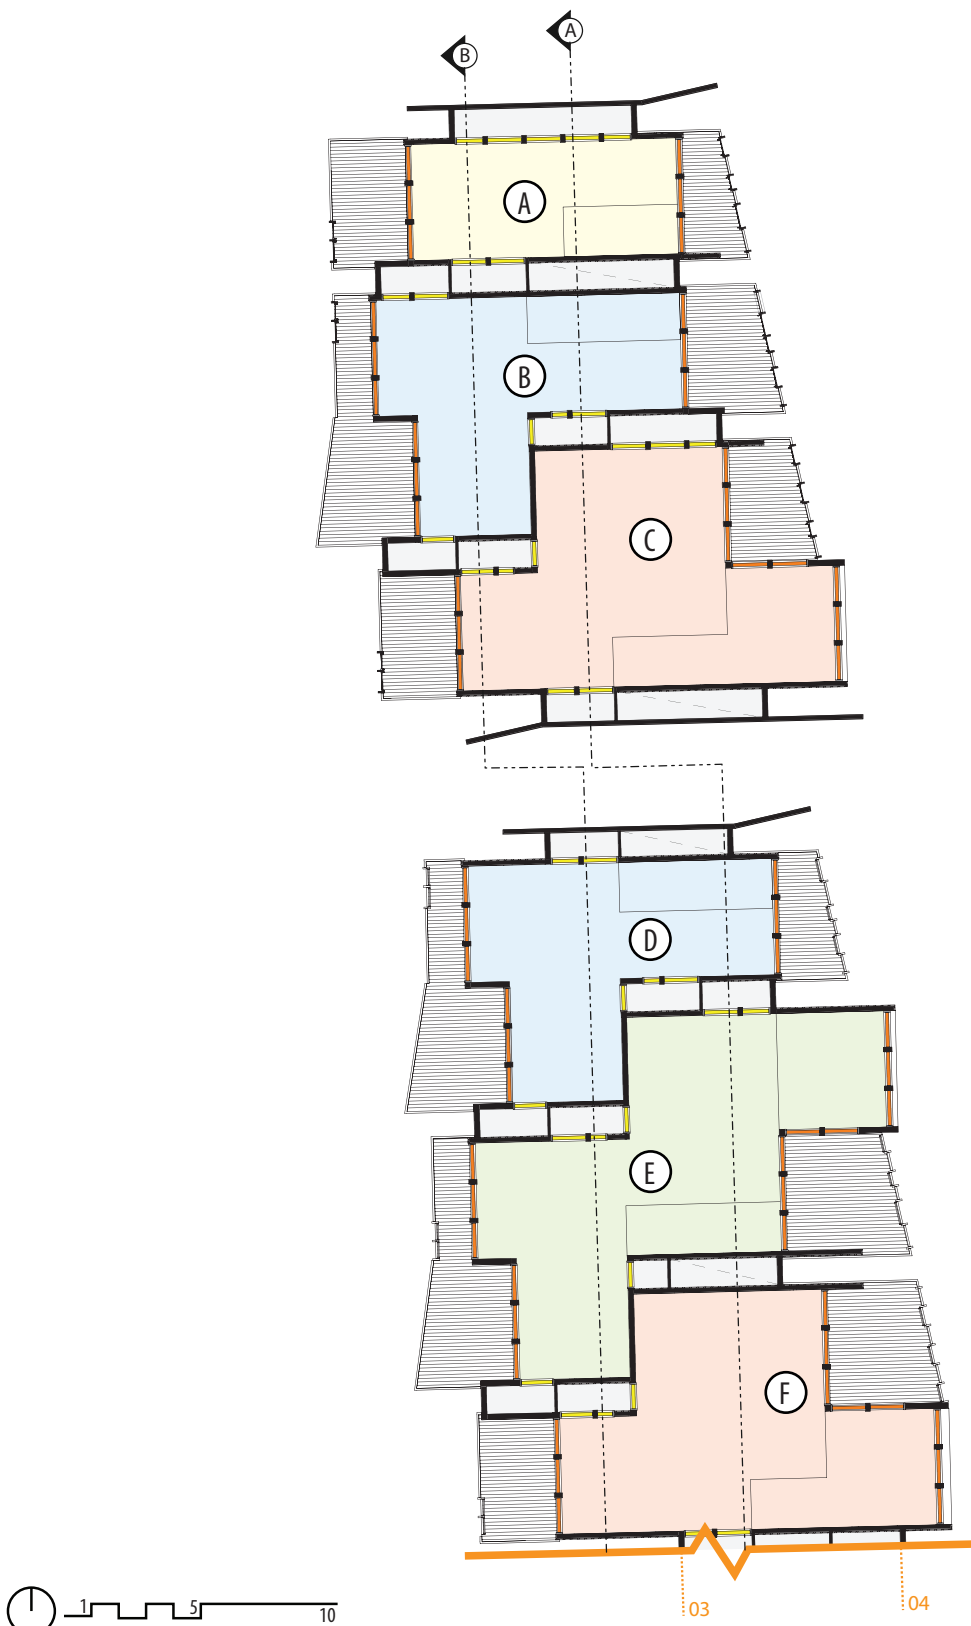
// First floor plans displaying the uninhabited dwellings A-F.
